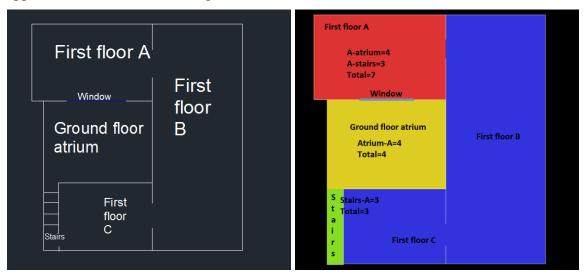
Example plan of two floors with window connecting atrium and room A, which are separated in terms of access by 4 spaces.
